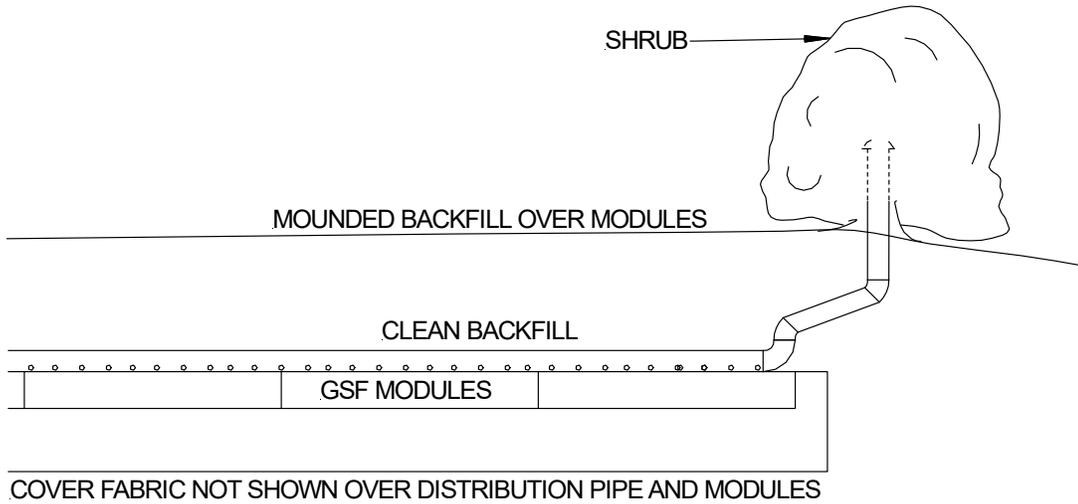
AIR BY-PASS LINE PLAN VIEW FOR VENTING OF PUMPED SYSTEMS
